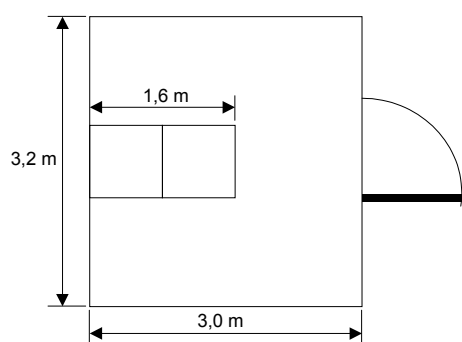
Minimum room dimensions to support distributors containing up to 500 outlets
